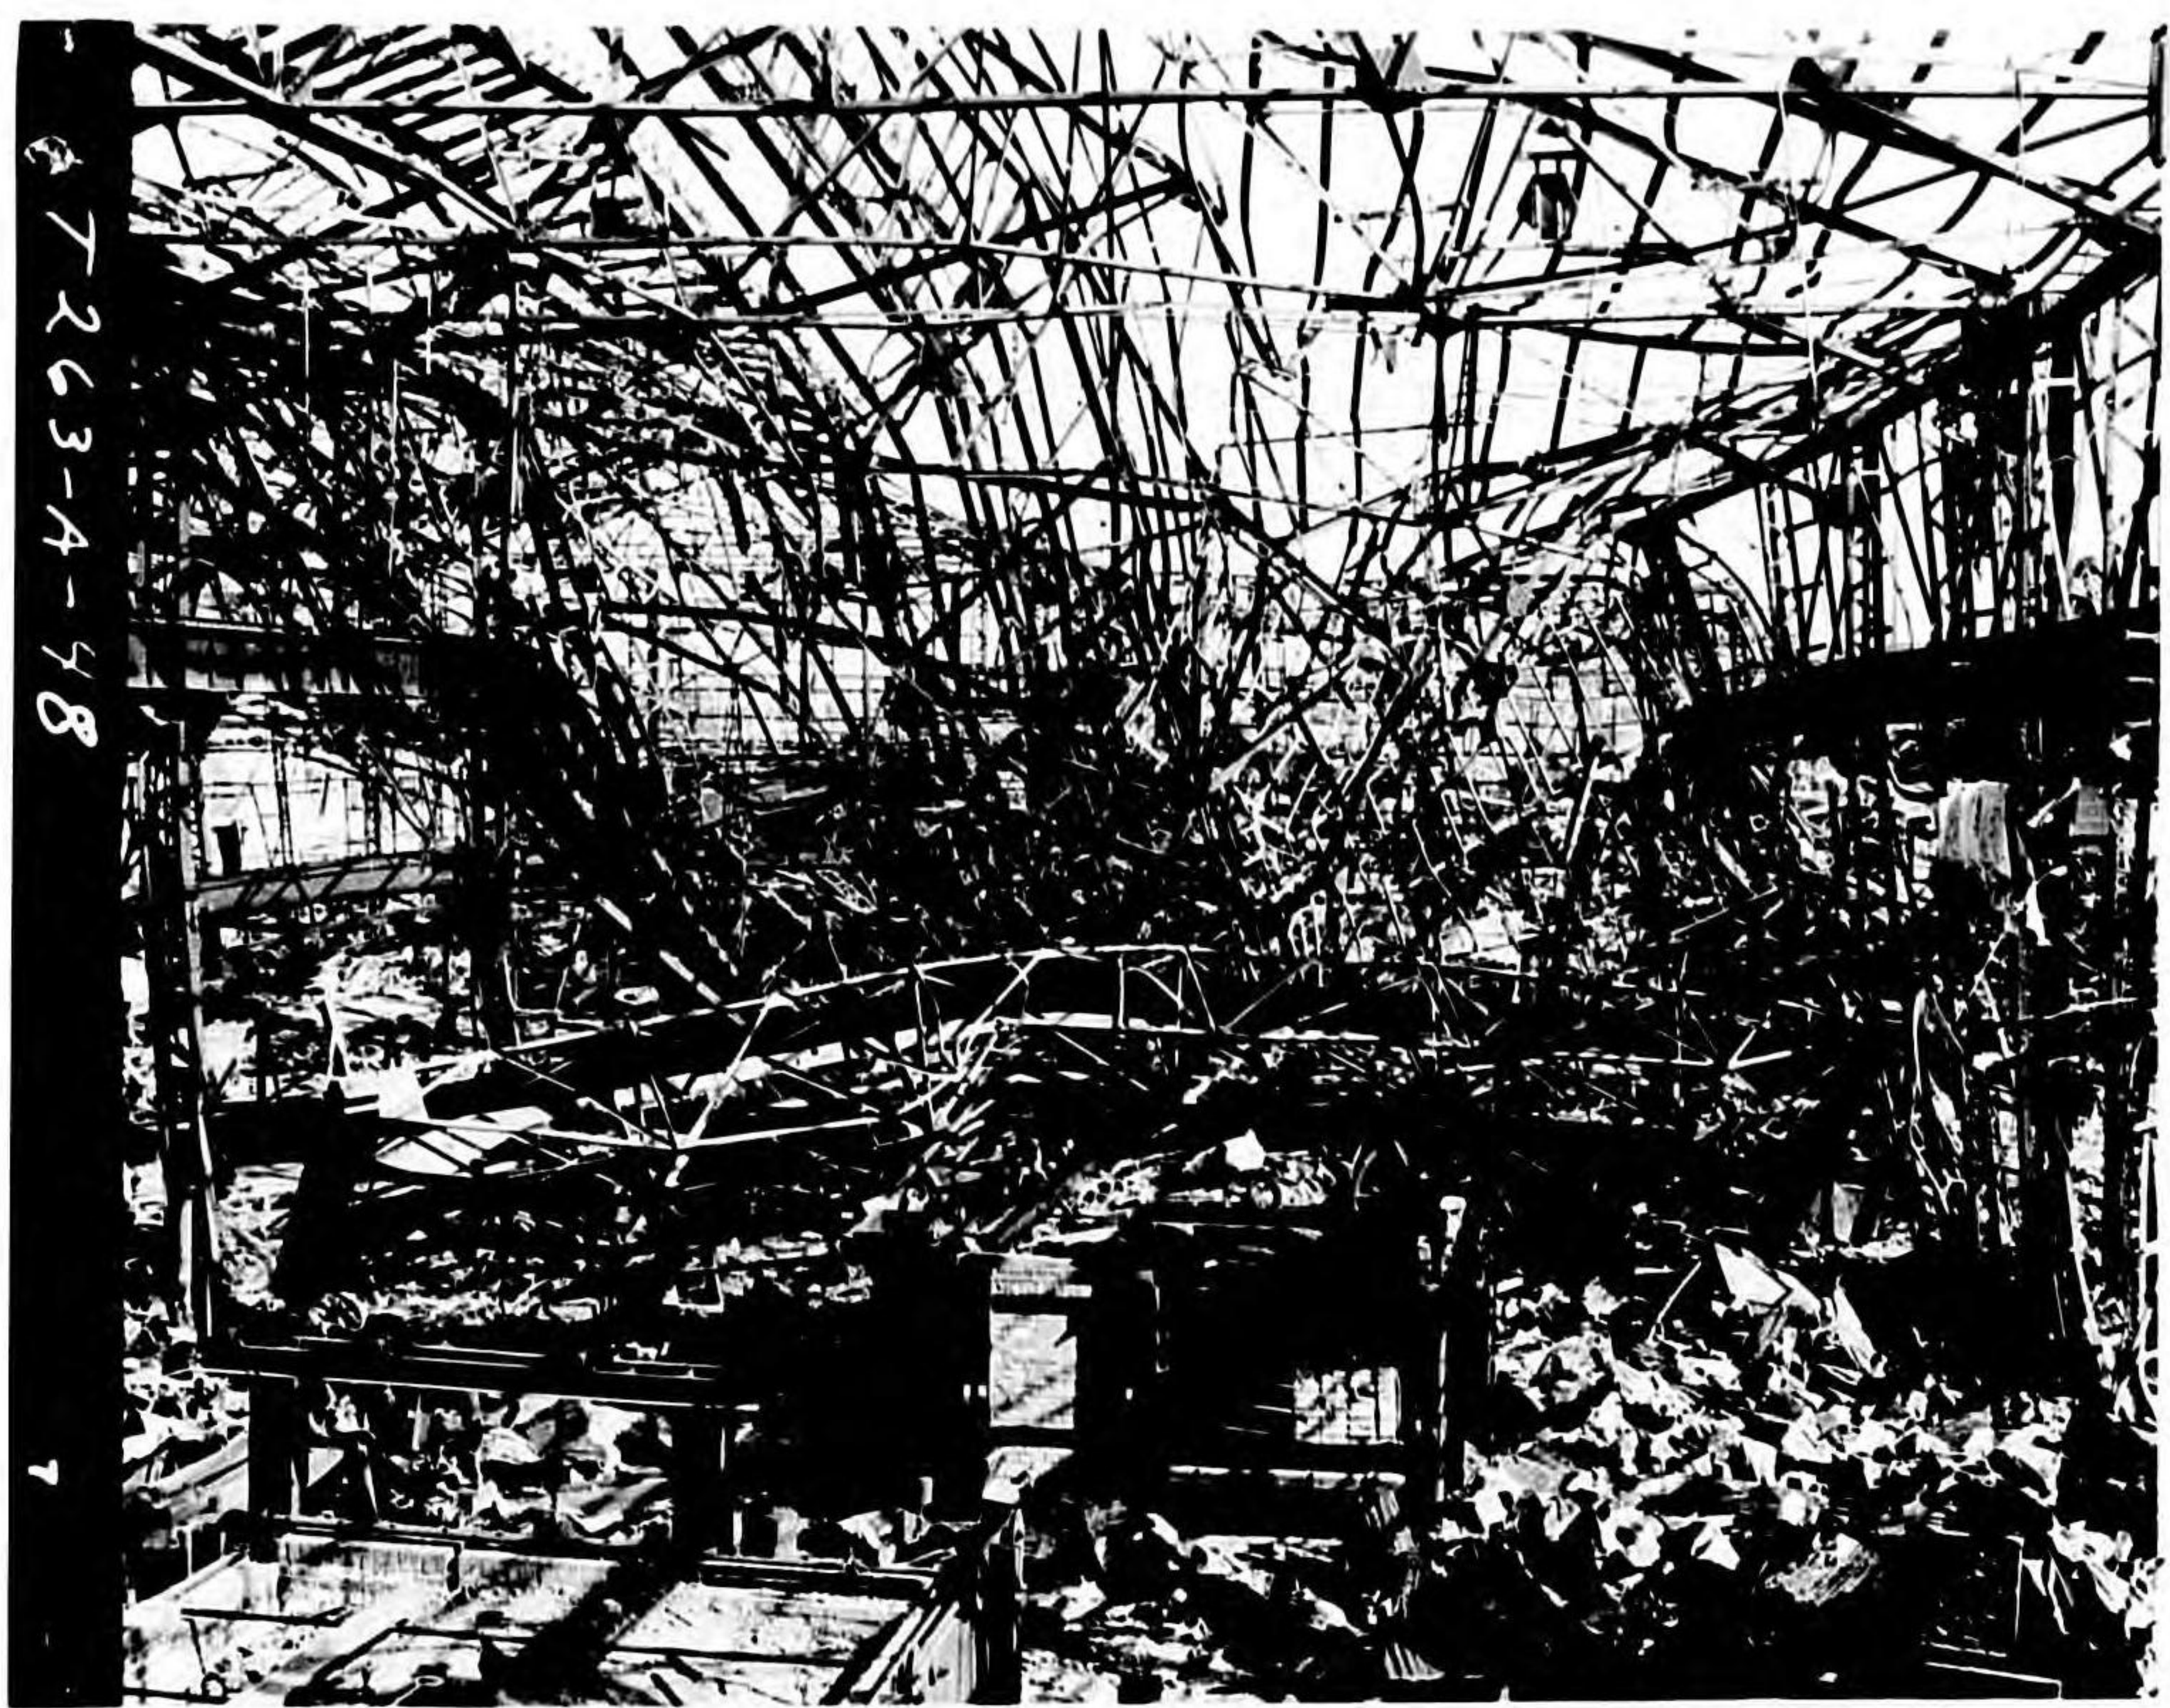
Bldg. 43, Bomb 93, Overhead crane damaged.
